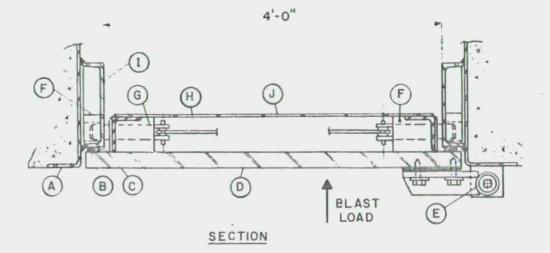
Single-leaf blast door with fragment shield (very high pressure)
